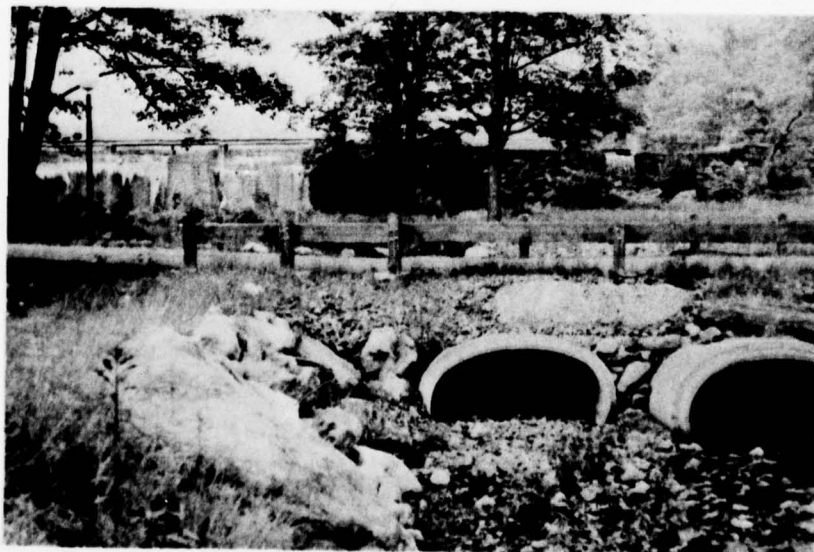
Overall view of dam and culverts in discharge channel under private road.
